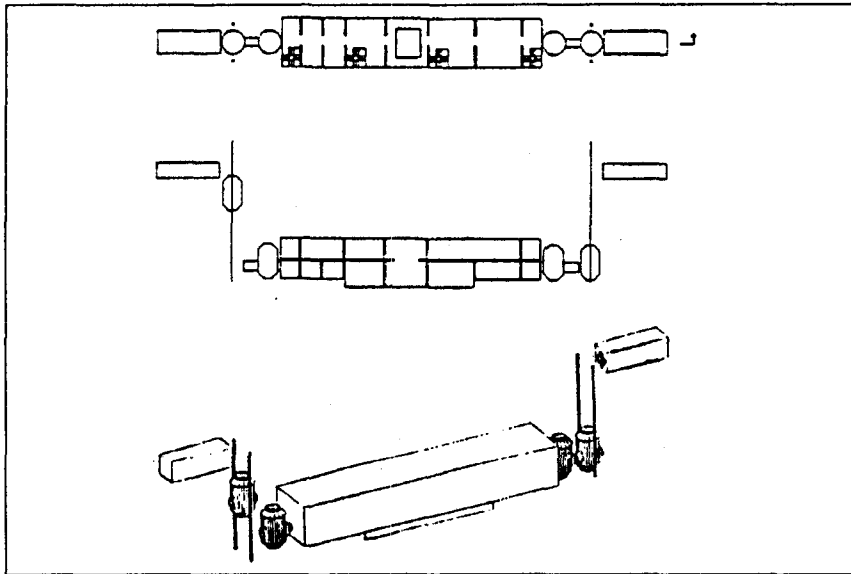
Plan, section and perspective of underground linear concept (from Moore & Rebholz, 1992).
